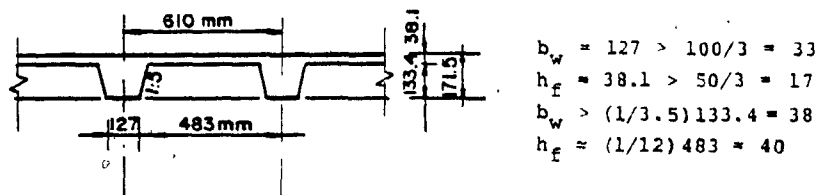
TYPICAL SECTION OF EQUIVALENT SCALE MODELS
